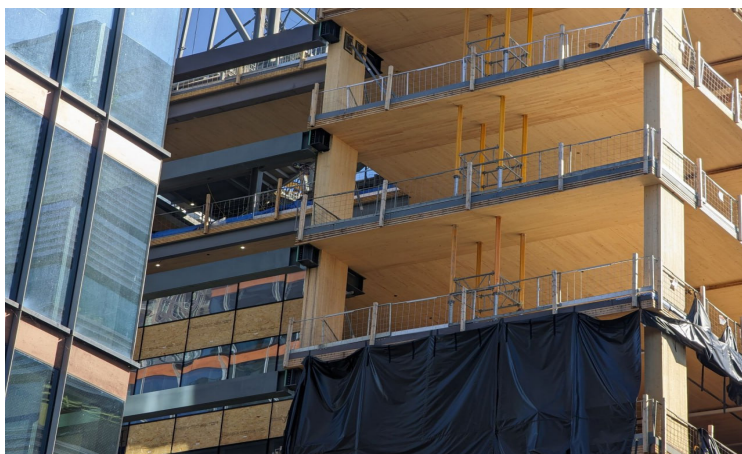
Limberlost Place, Ontario, Canada. The building process
